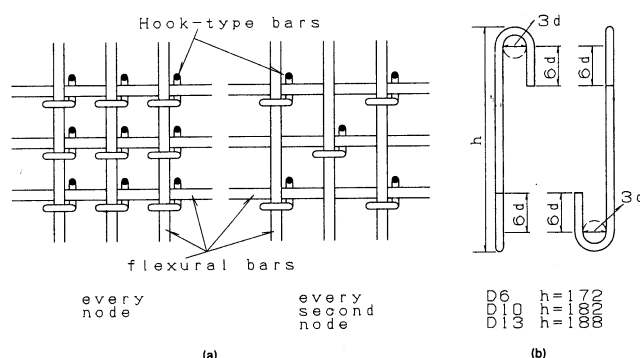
Hook-type shear reinforcement (dimensions in mm; 1 mm = 0.039 in.)
